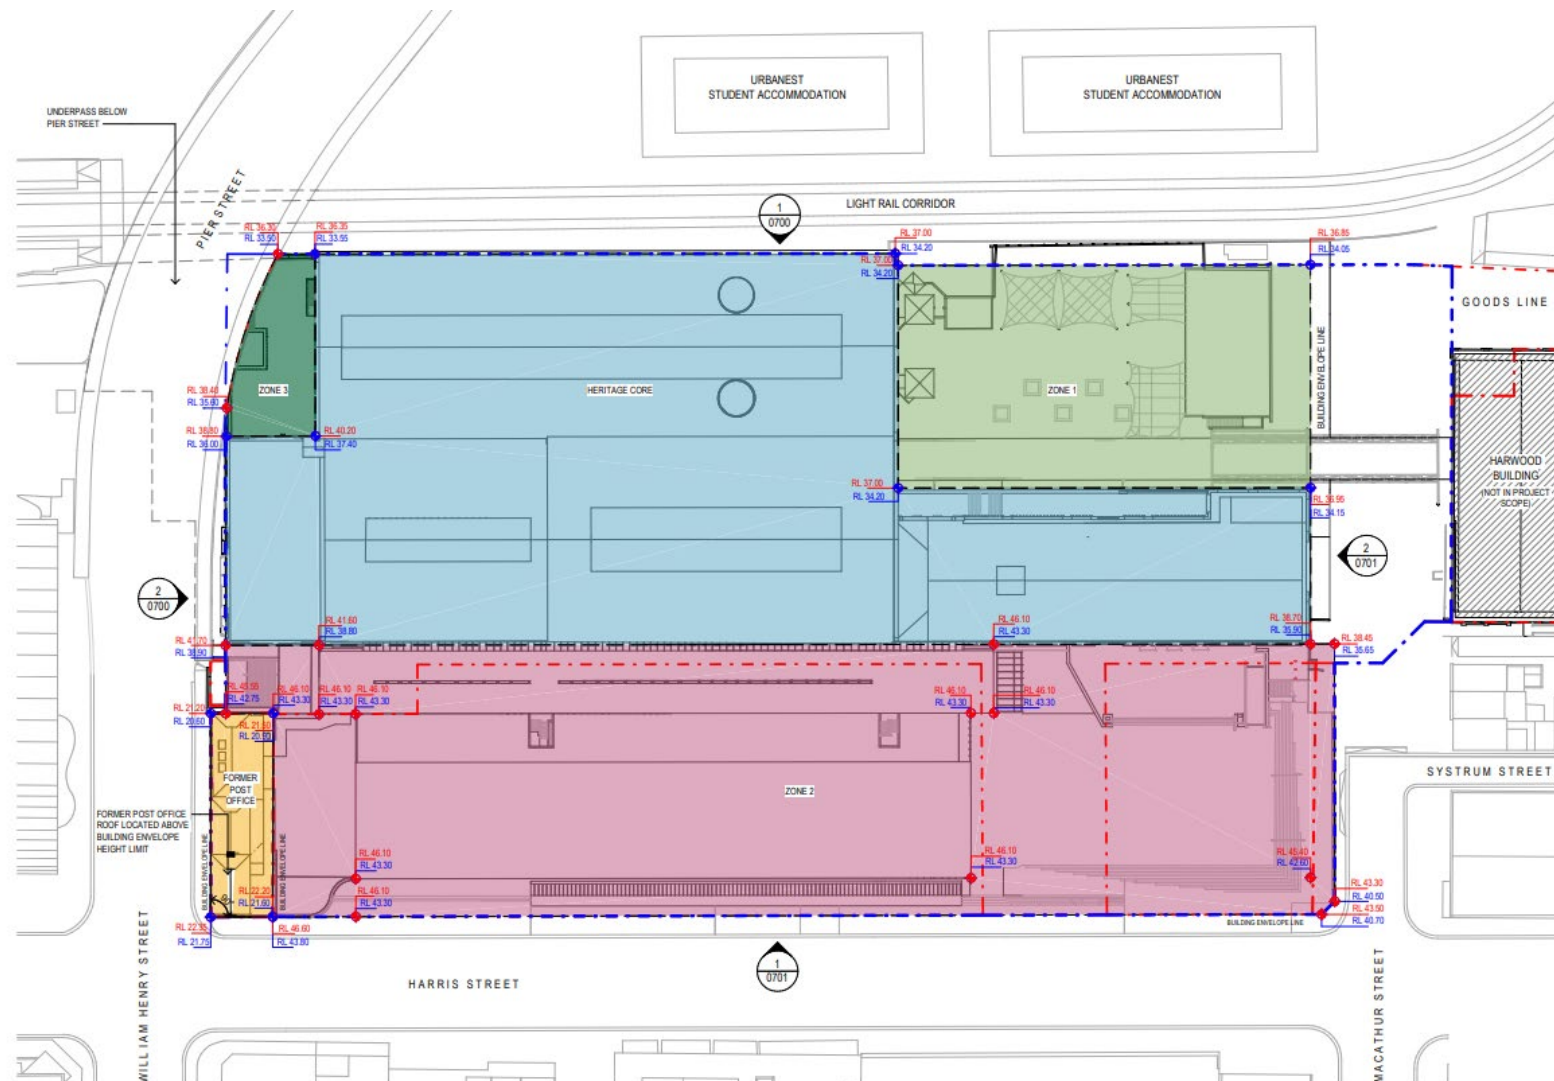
Ultimo Powerhouse- Building Envelope Plan (Source: John Wardle Architects, 17 May 2022)
